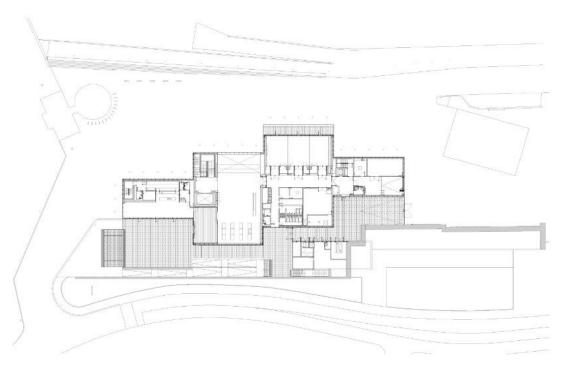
Ground Floor Plan Turner Contemporary Art Gallery
